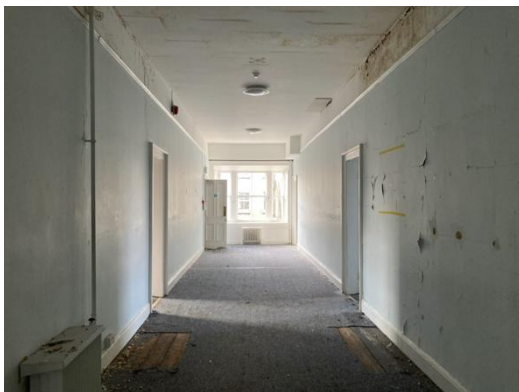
Central spine corridor. Original timber floor under carpet finish. Staining to ceiling evident.
